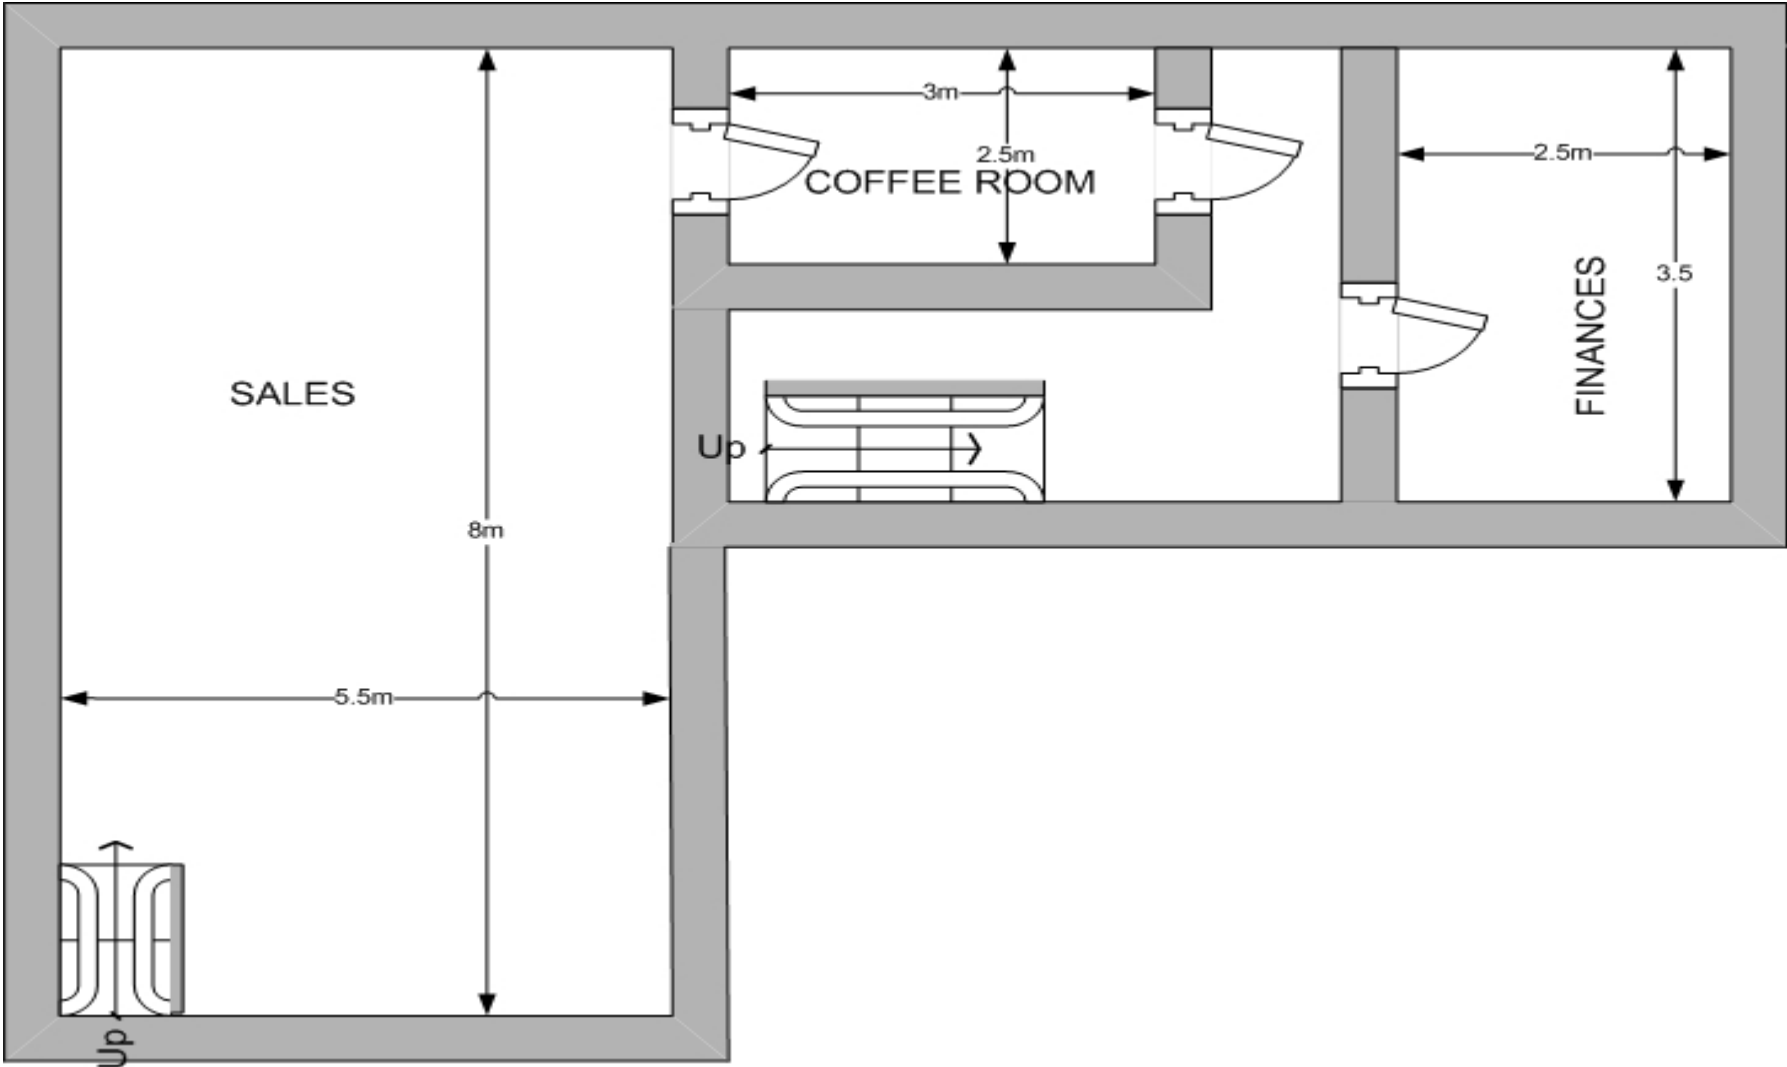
Departmental Facility Layout to be Implemented (Top Floor)
